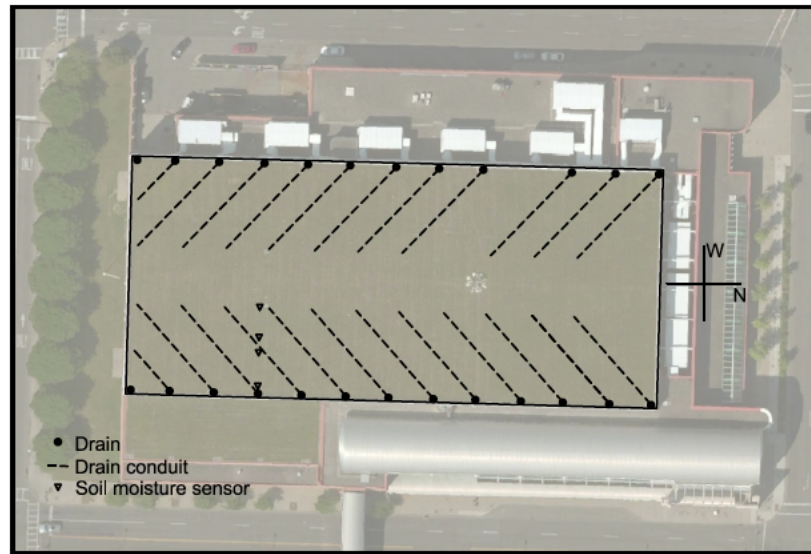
Location of roof drains and drain conduits on the OnCenter green roof. Soil moisture sensors located along a transect on the eastern side of the roof are shown.
